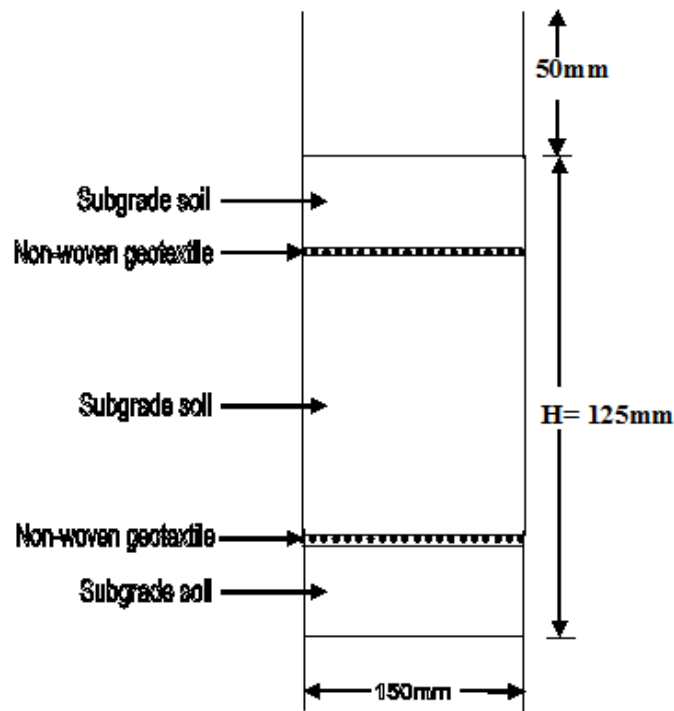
Cross-sectional diagram showing the subgrade soil and non-woven geotextile layers
